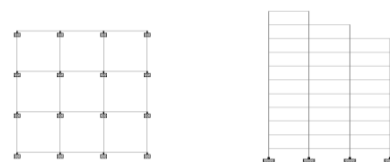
Plan & Elevation of 10 storied regular and irregular frames considered for study
